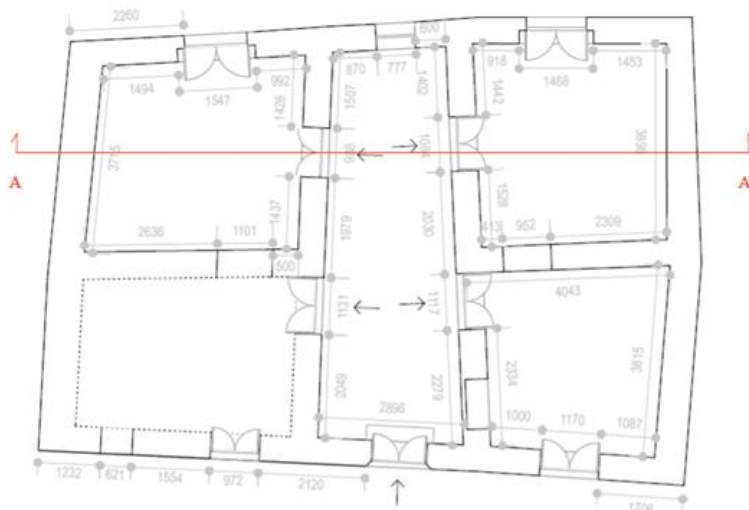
Floor plan of the Menen house. Shimizu, N. 2016
